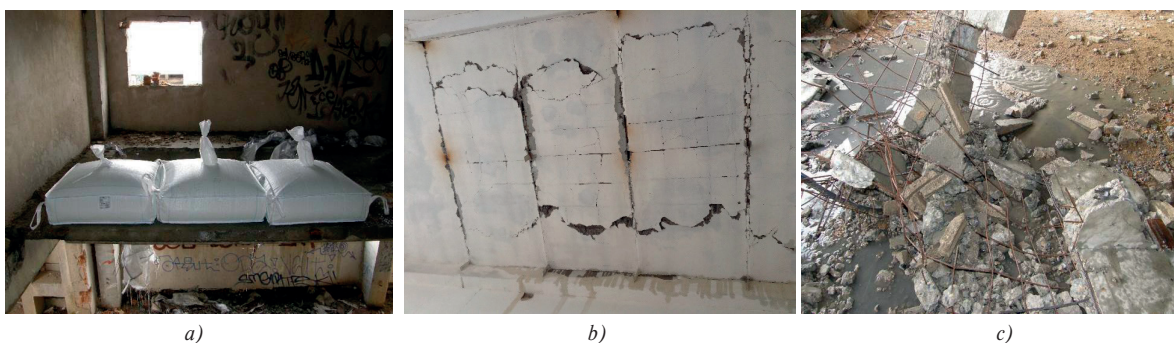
Field tests a) position of charges b) cracks on concrete slabs c) destruction of samples
